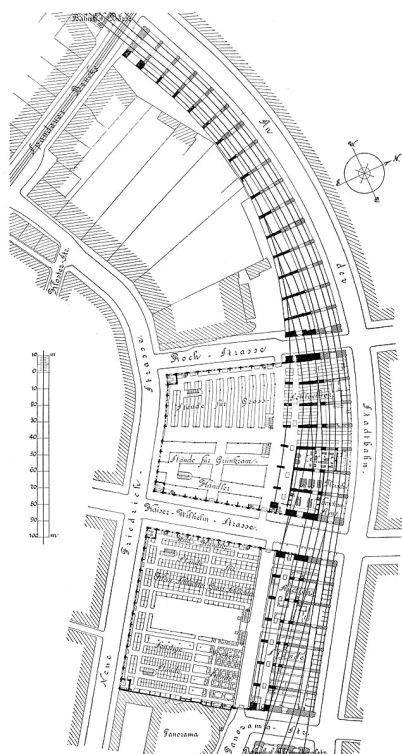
Central Market Hall in Berlin – site plan, 1896 (source: [17])
